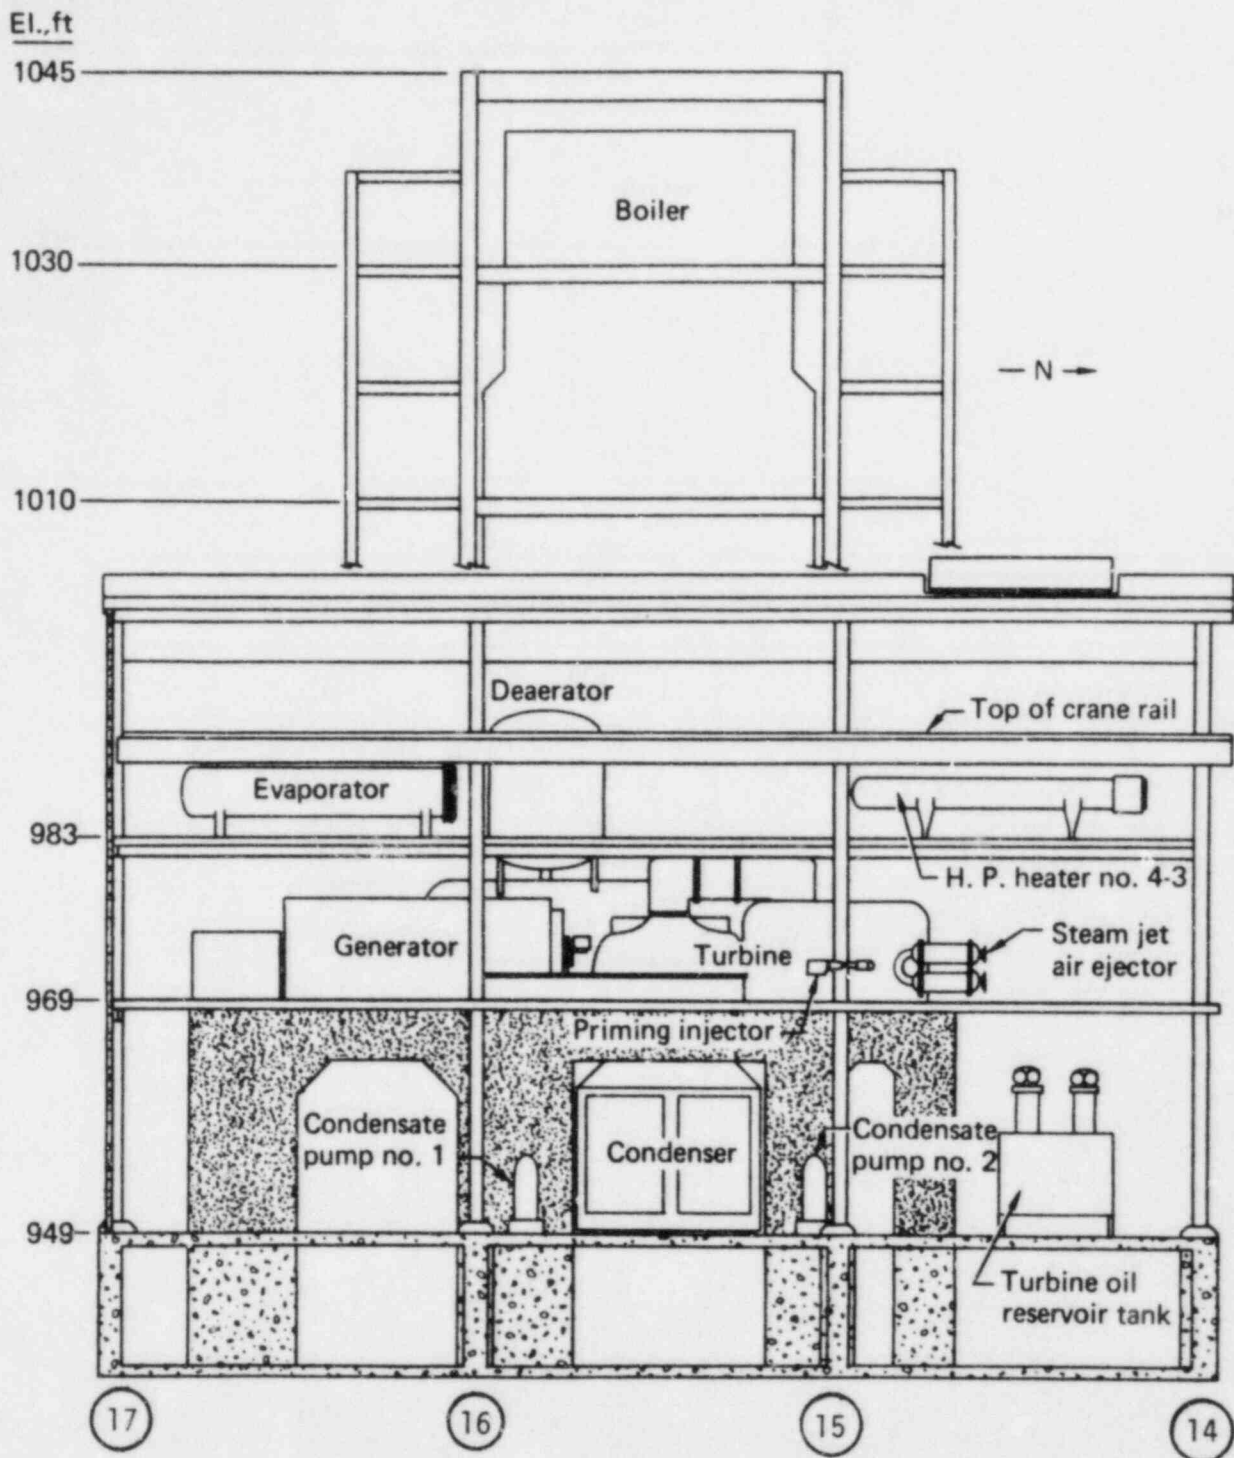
ELEVATION DRAWING, LOOKING WEST AT COLUMN LINE B, OF THE EL CENTRO STEAM PLANT, UNIT 4 (REFERENCE E-1)
